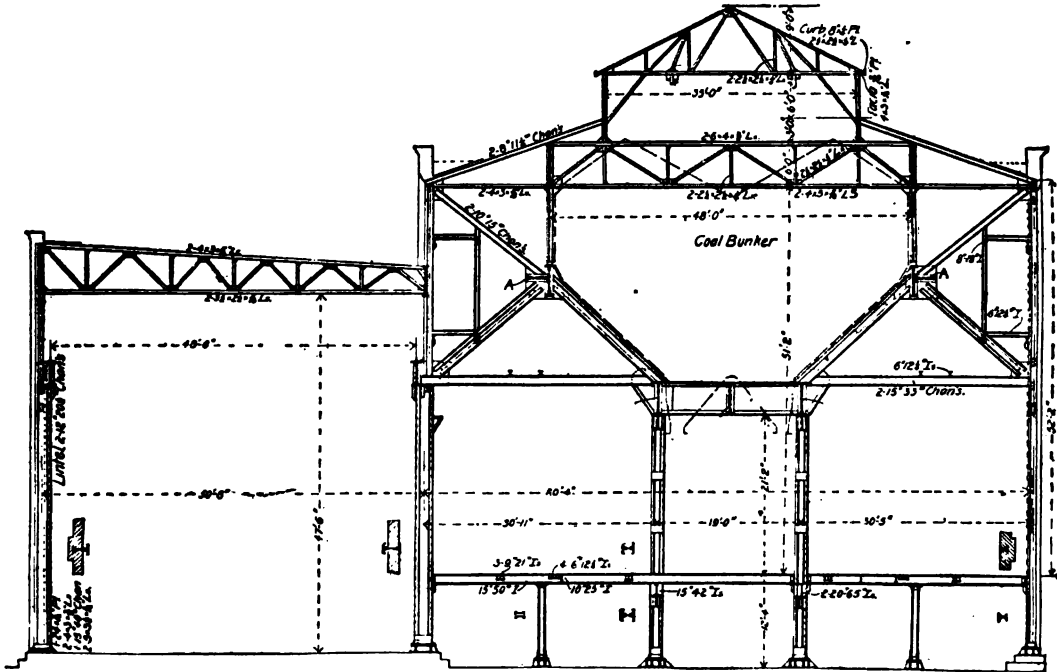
Steel Structure of the General Electric Co.'s Plant, Schenectady, N.Y.
